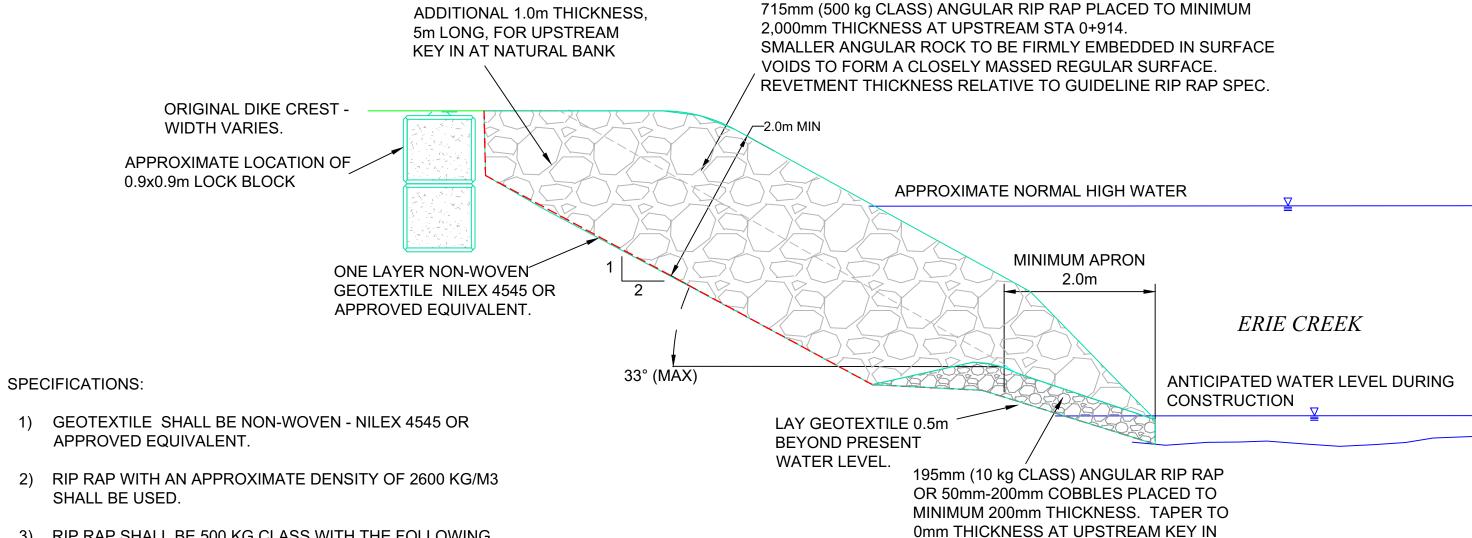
DETAIL A-A - DIKE TYPICAL SECTION SCALE: 1:50
